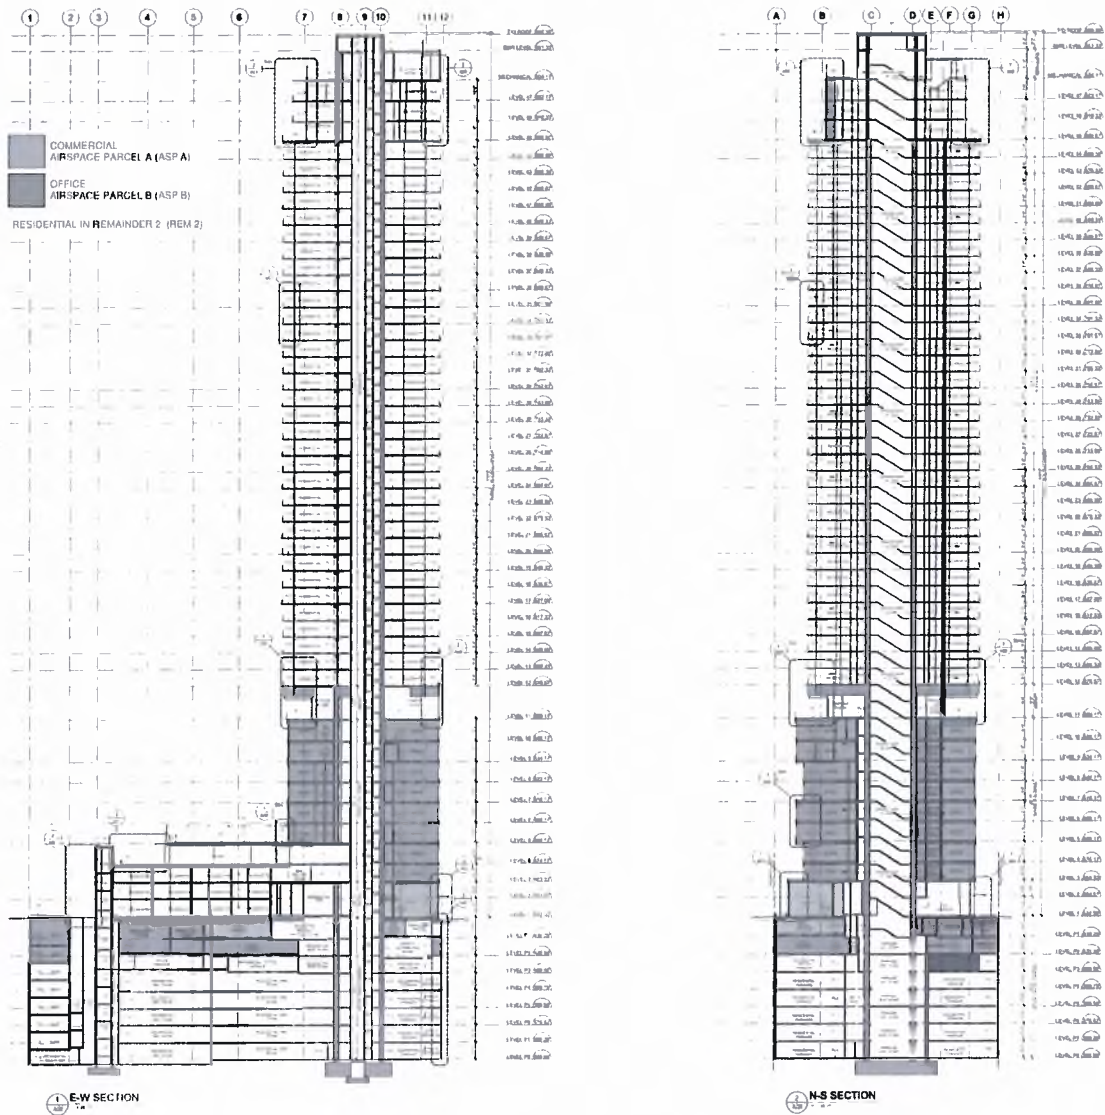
Section illustrations of the building's two air space parcels and remainder lot.
